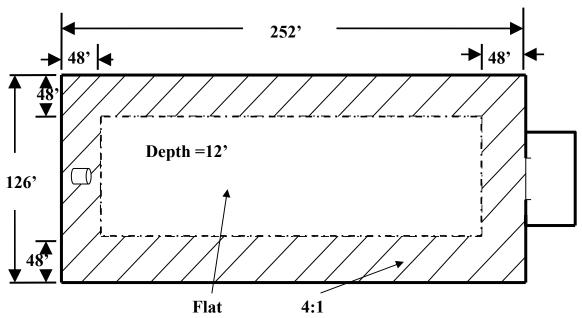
G.2-2 Plan View of SJRWMD Pond at the Top of the Permanent Pool Volume
